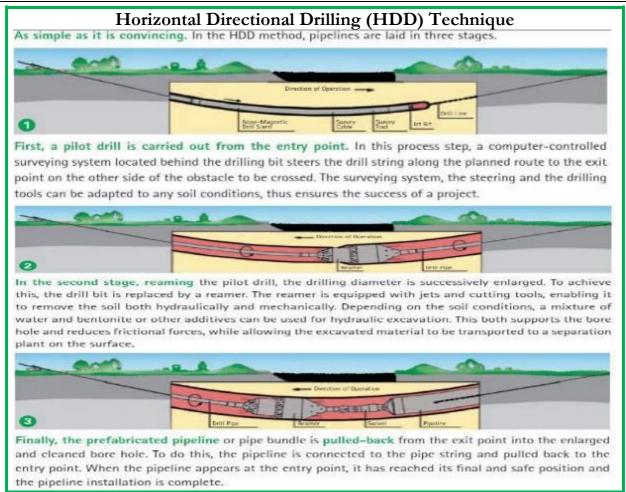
Pictures showing Horizontal Directional Drilling (HDD) Technique.
